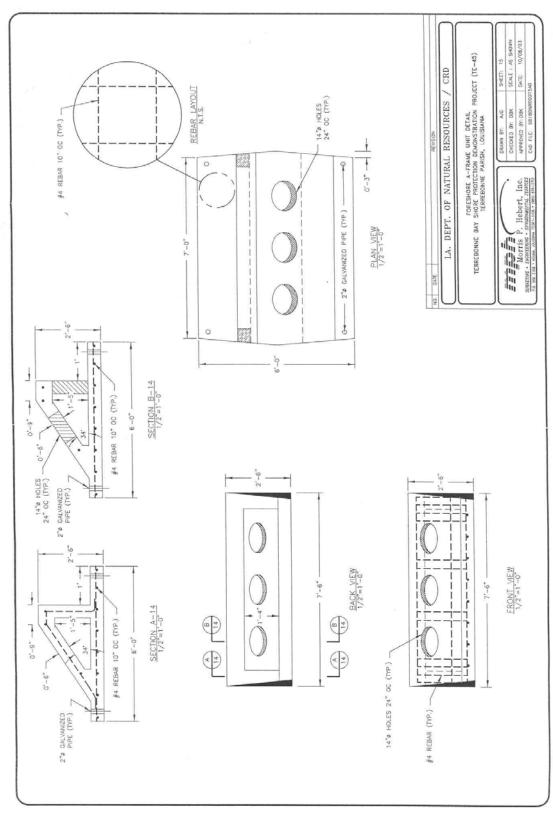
Detail of a Concrete Frame unit (MPH, Inc. 2003).
